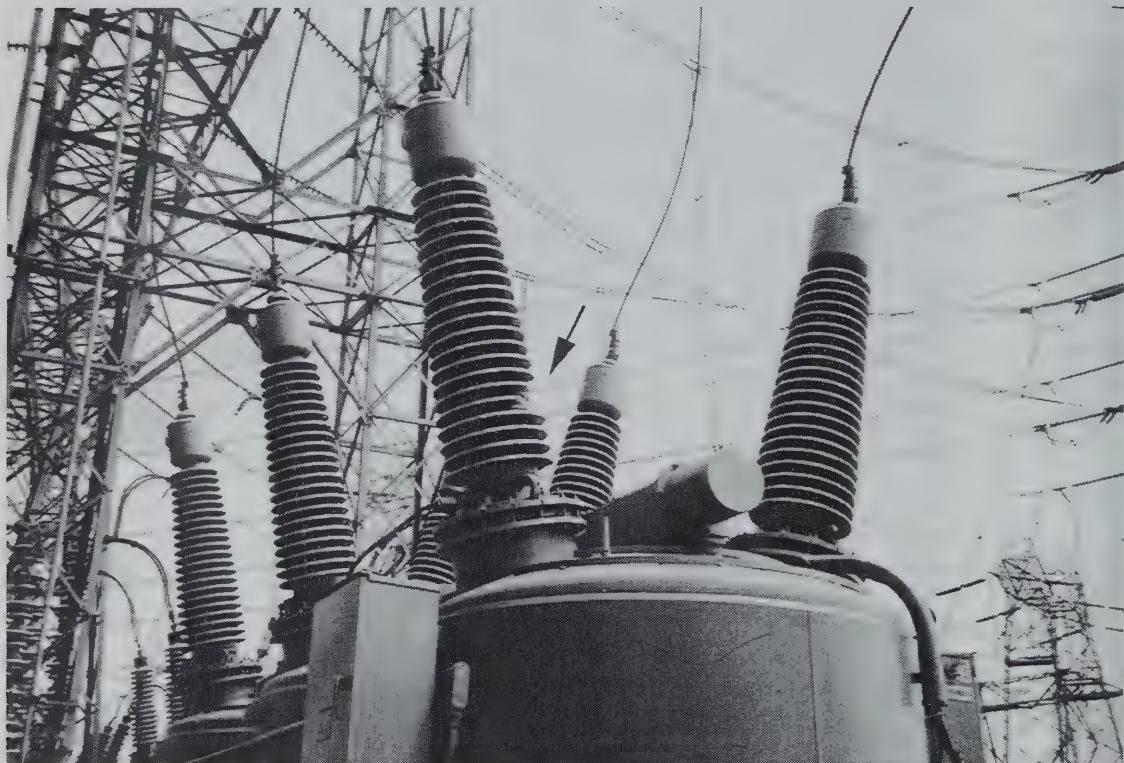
Parts of damaged disconnect switches located above the circuit breaker fell and damaged the circuit breaker bushing. The chipped shed did not affect the operation of the circuit breaker.
